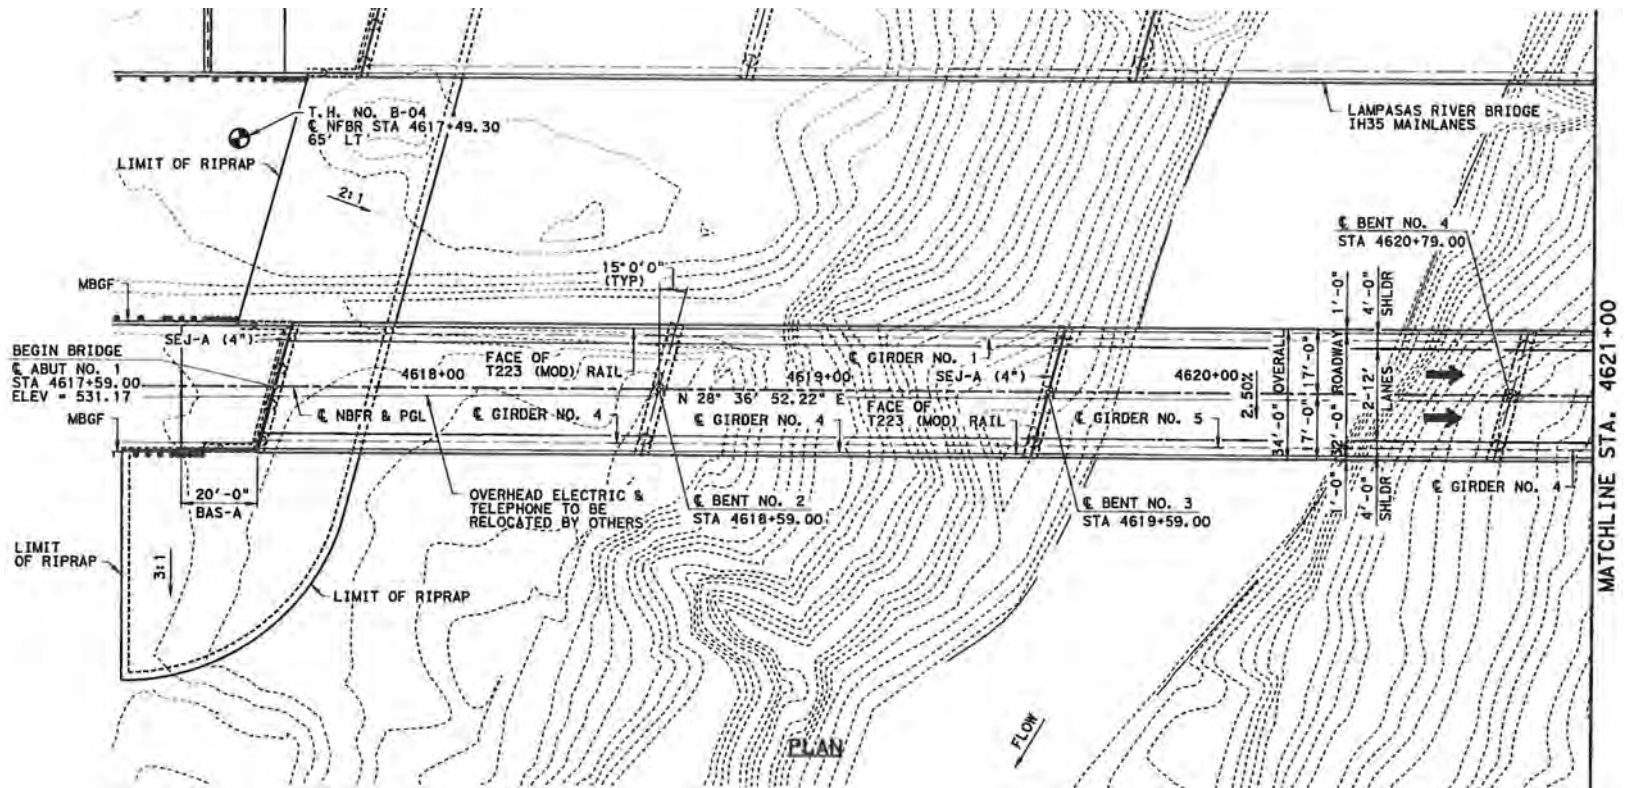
Plan view of Lampasas River Bridge (Spans 1 to 3)
